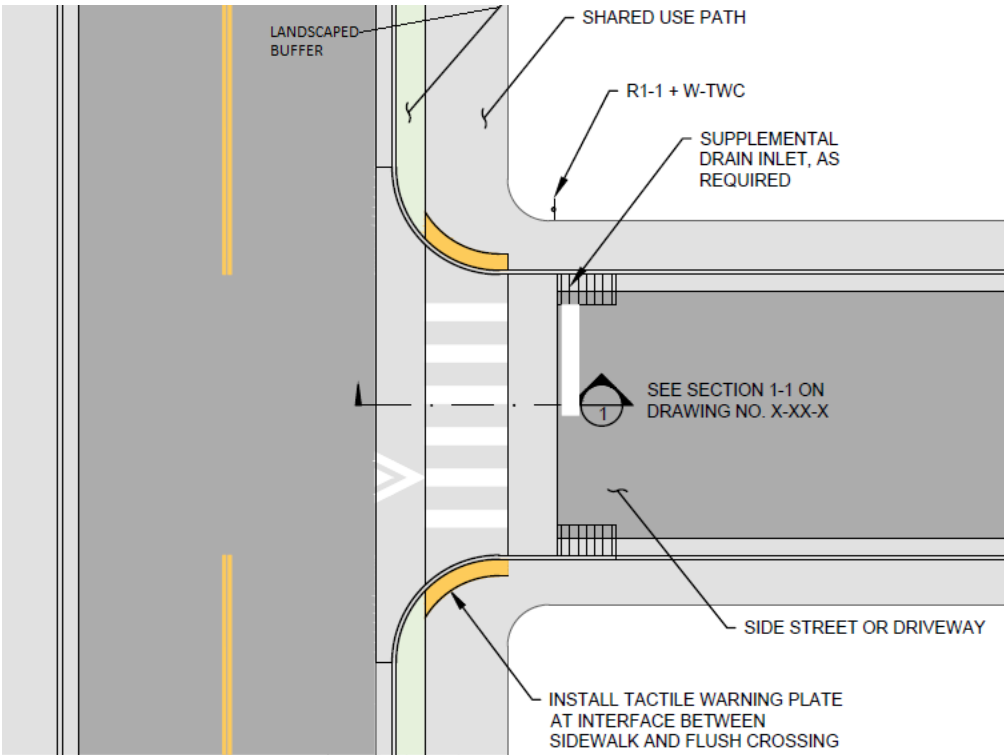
~~XXX~~6 – Typical Layout of Raised Crossing at Intersection Leg Location
